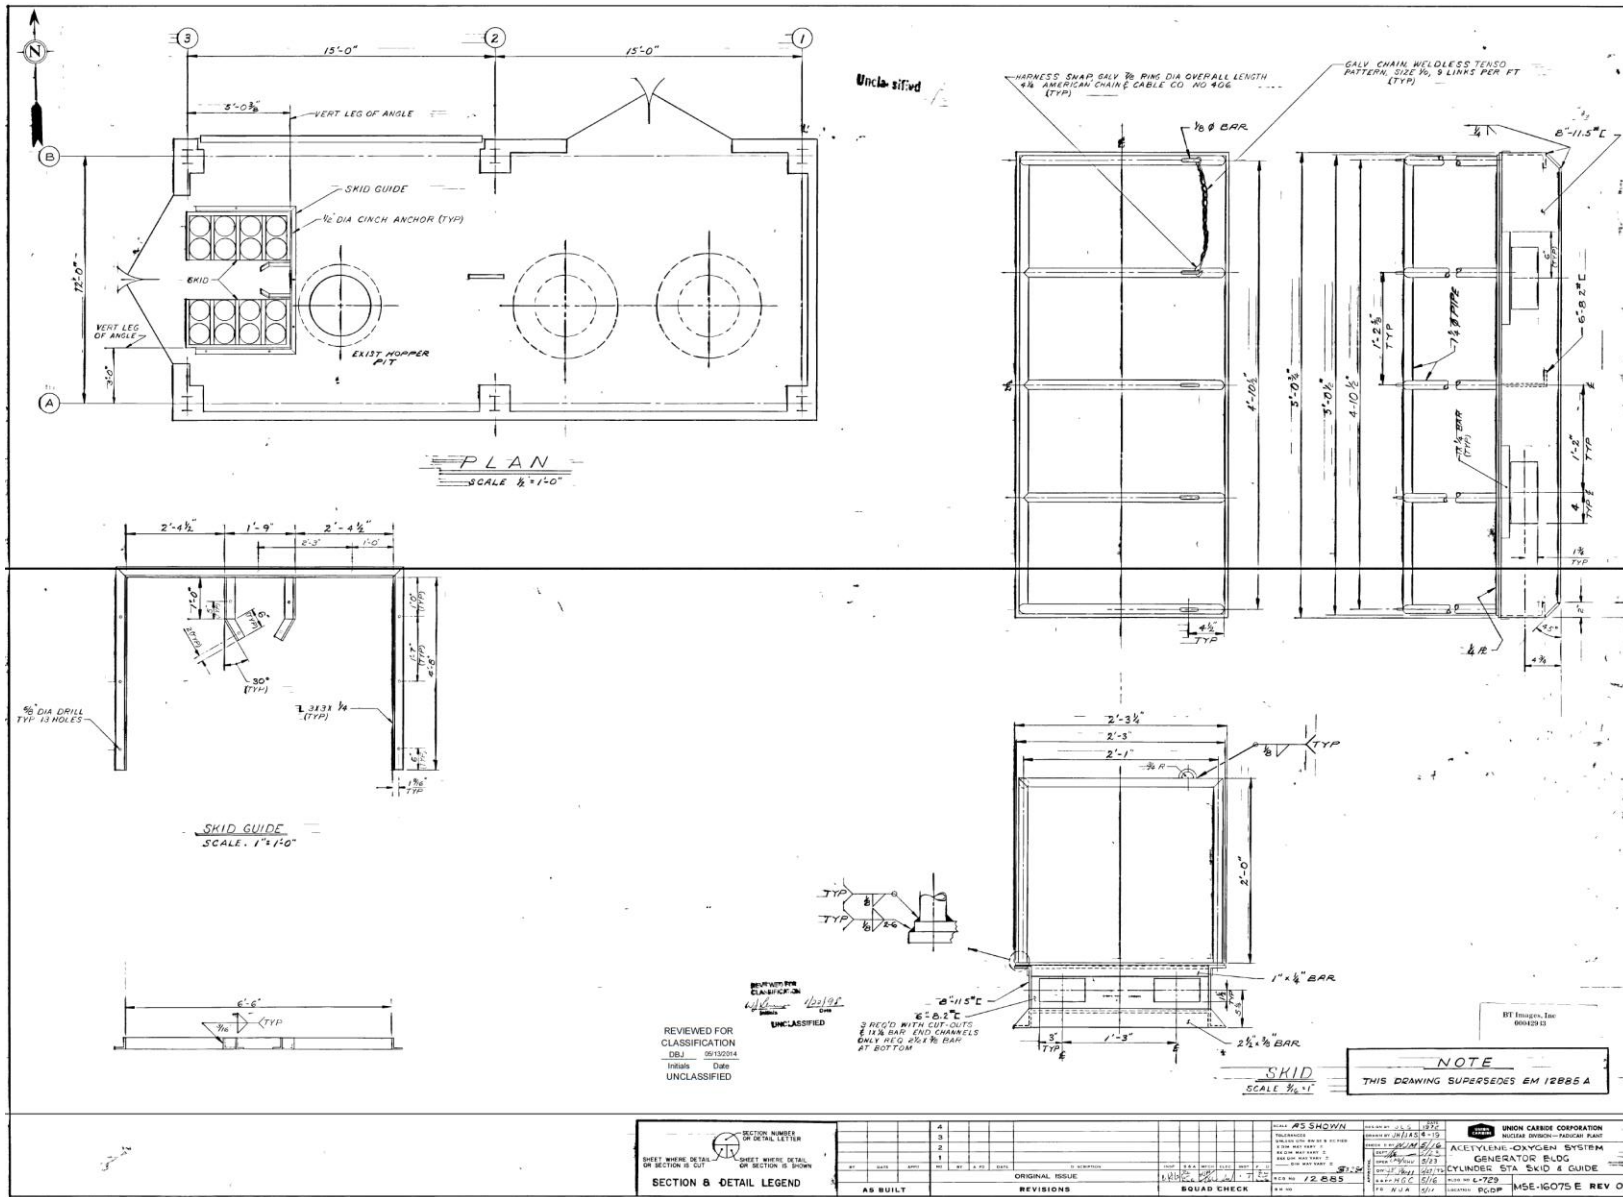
Engineering Drawing M5E-16075-E, Rev. 0
